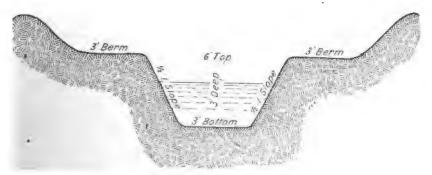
Type of hand-dug ditch suitable for heavy soils.
